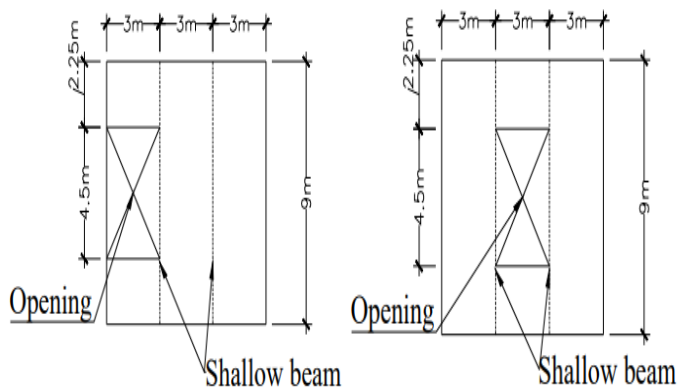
opening position 3 for three panel slab (o3) Fig-6: opening position 4 for three panel slab(o4)
